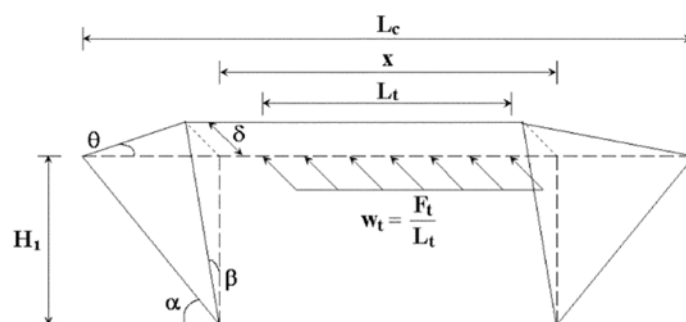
Proposed trapezoidal yield line pattern for bridge barrier by Jeon et al. (2011)
